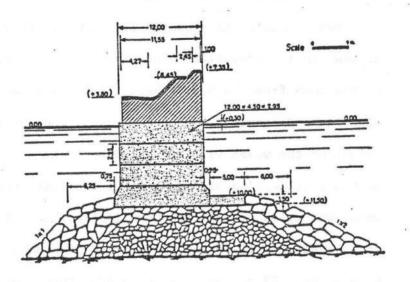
Section of Western Extension of Outer Breakwater; Genoa (Design in Cyclopean Blocks)
